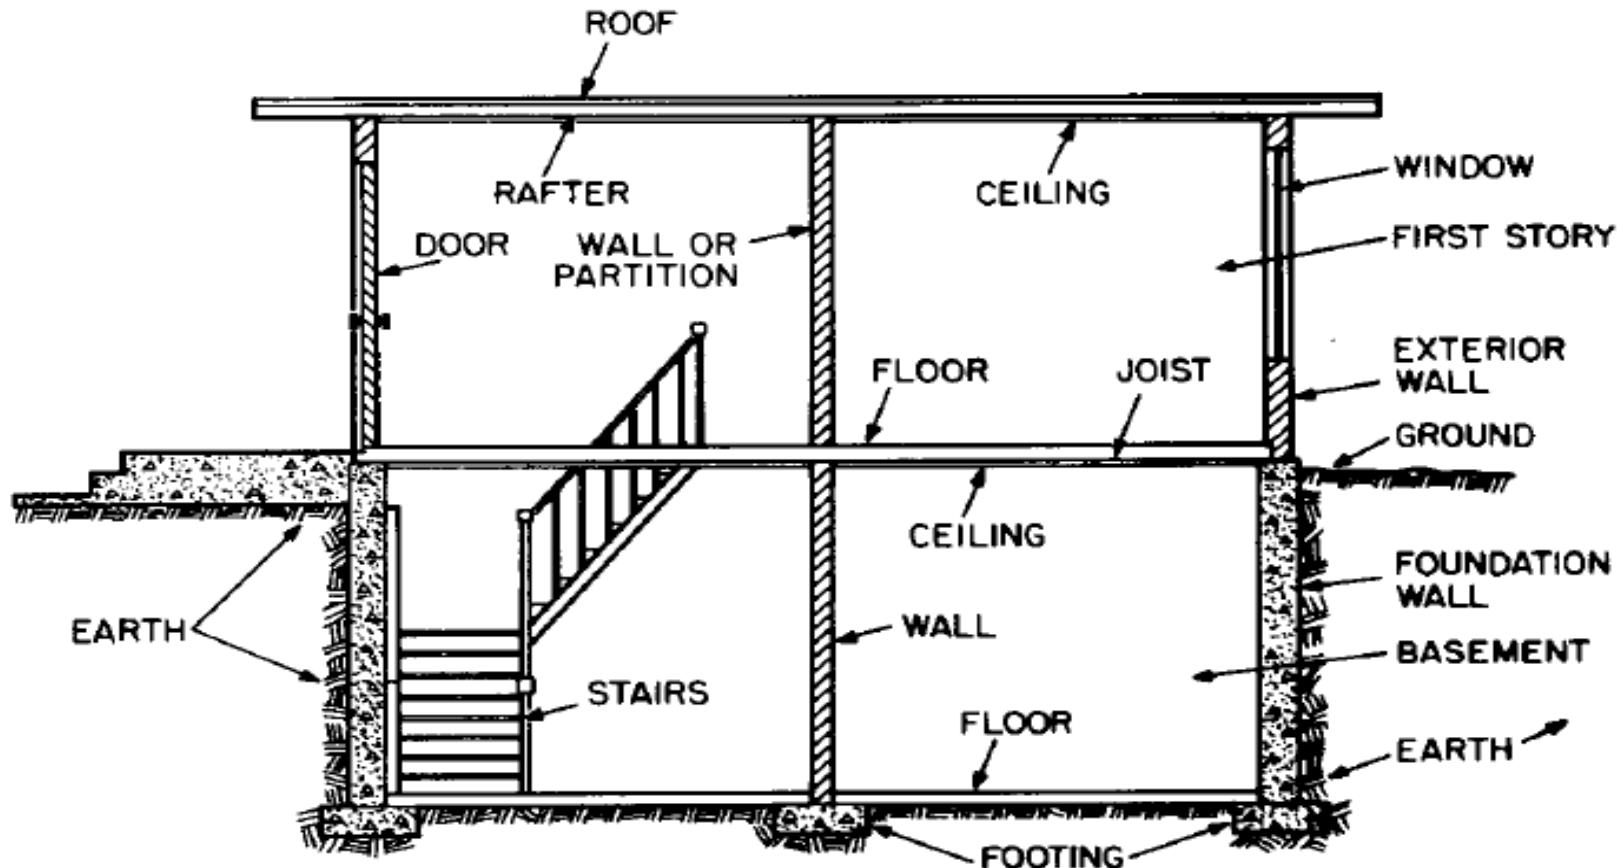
Vertical section through a one-story building with basement shows location of some major components. (Reprinted with permission from F. S. Merritt and J. Ambrose, "Building Engineering and Systems Design," 2d ed., Van Nostrand Reinhold, New York.)
